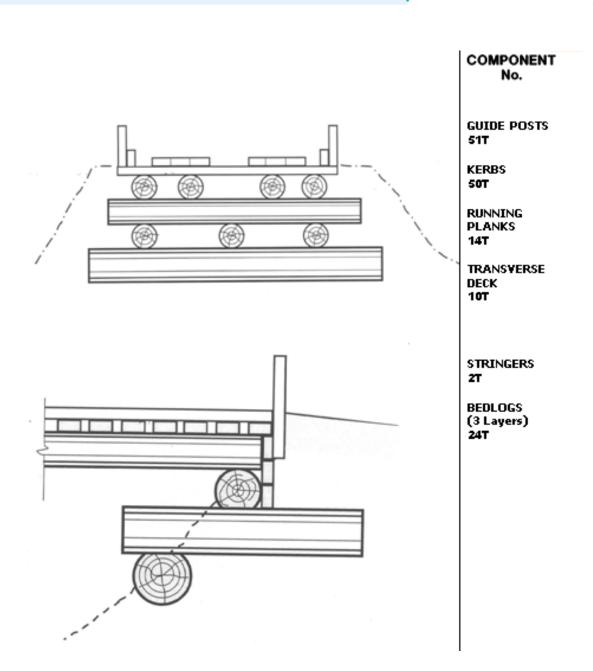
A - VICFOREST TYPE TIMBER BRIDGE ABUTMENT
